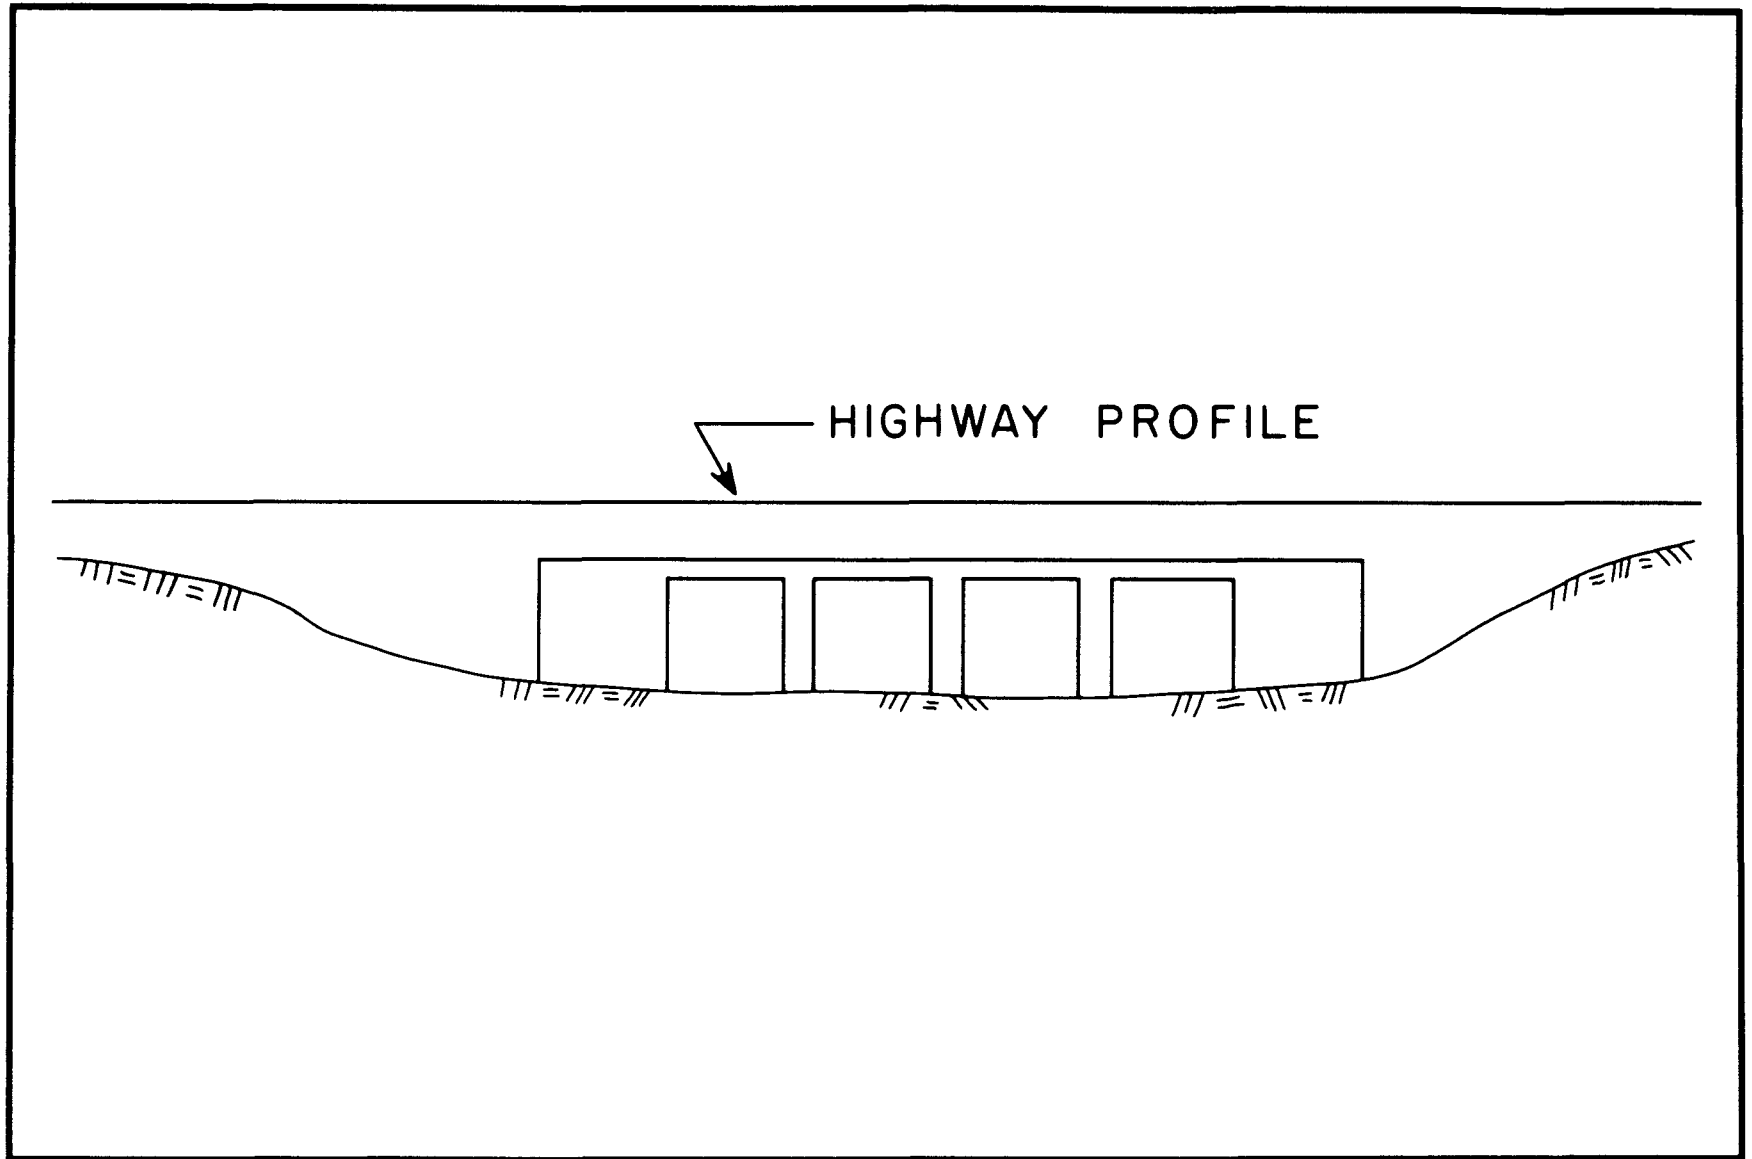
SINGLE OPENING CULVERT (FOUR BARREL BOX CULVERT)
